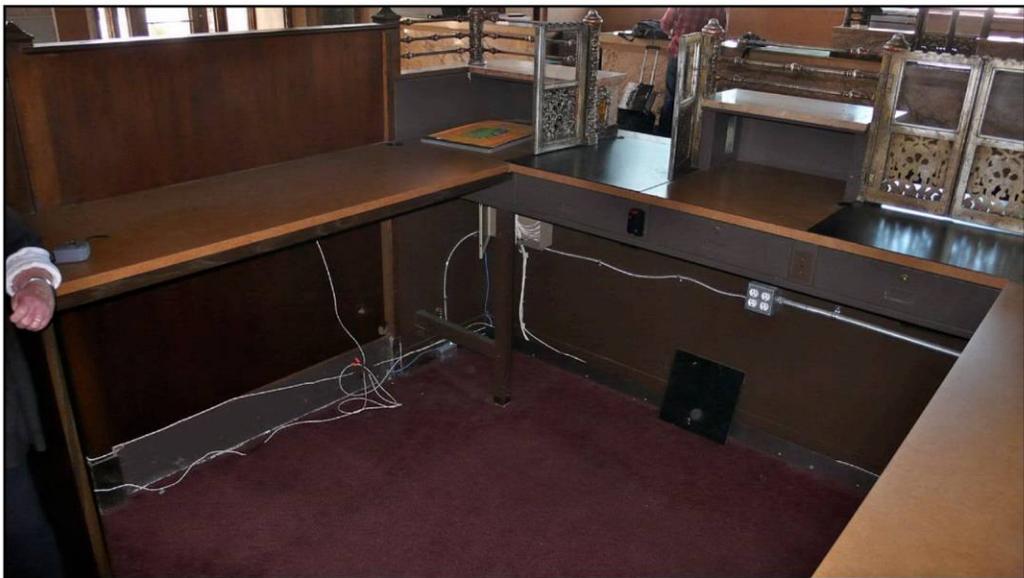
Modern countertops behind teller cages. [3-4-2013]
